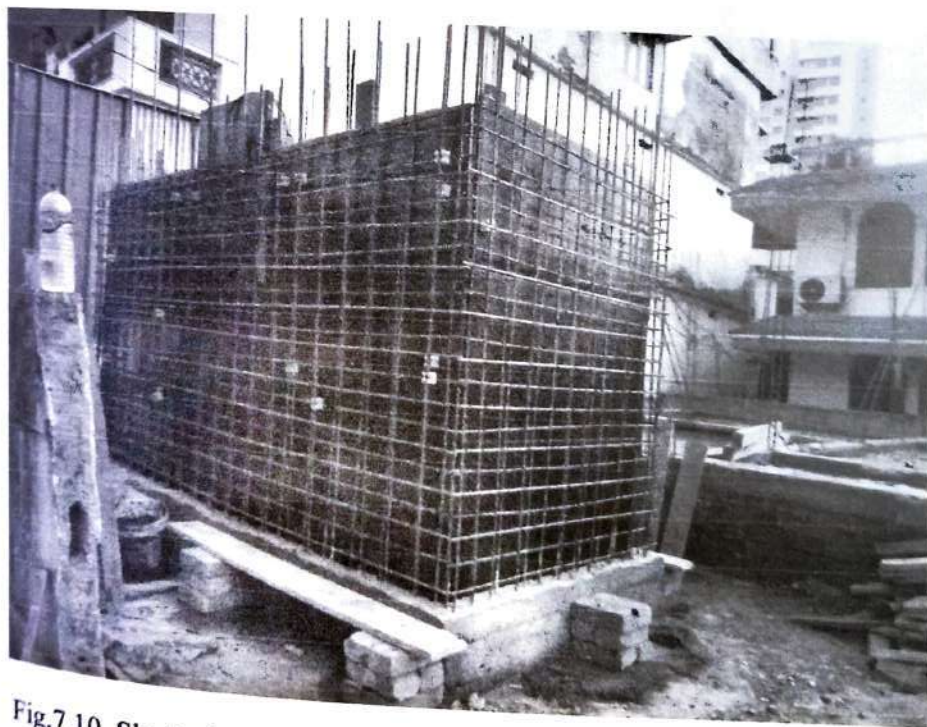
Shuttering and erection of reinforcement to cast the water tank
